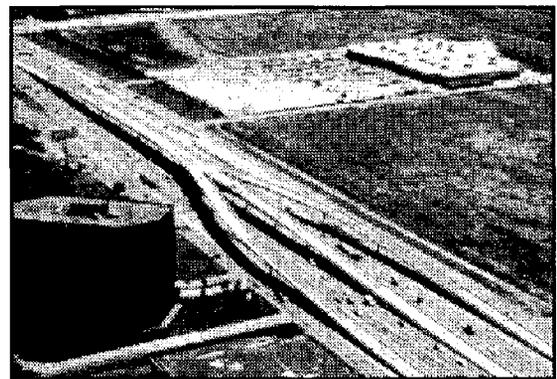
Elevated Slip Ramp.⁽⁹⁾
